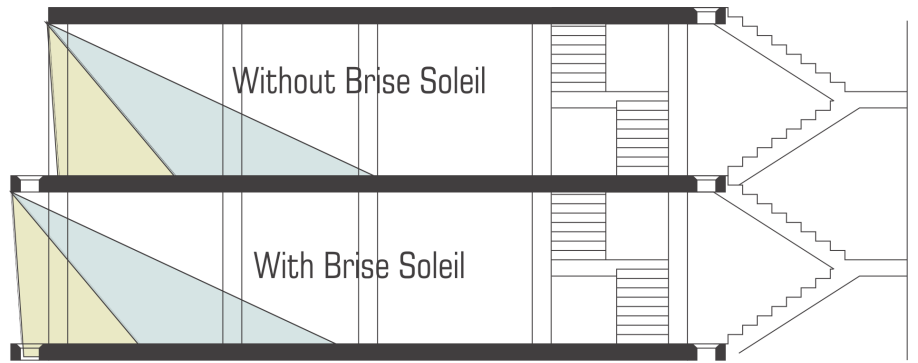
Section of building indicating sun angles and floors with and without brise soleil (by Author)
